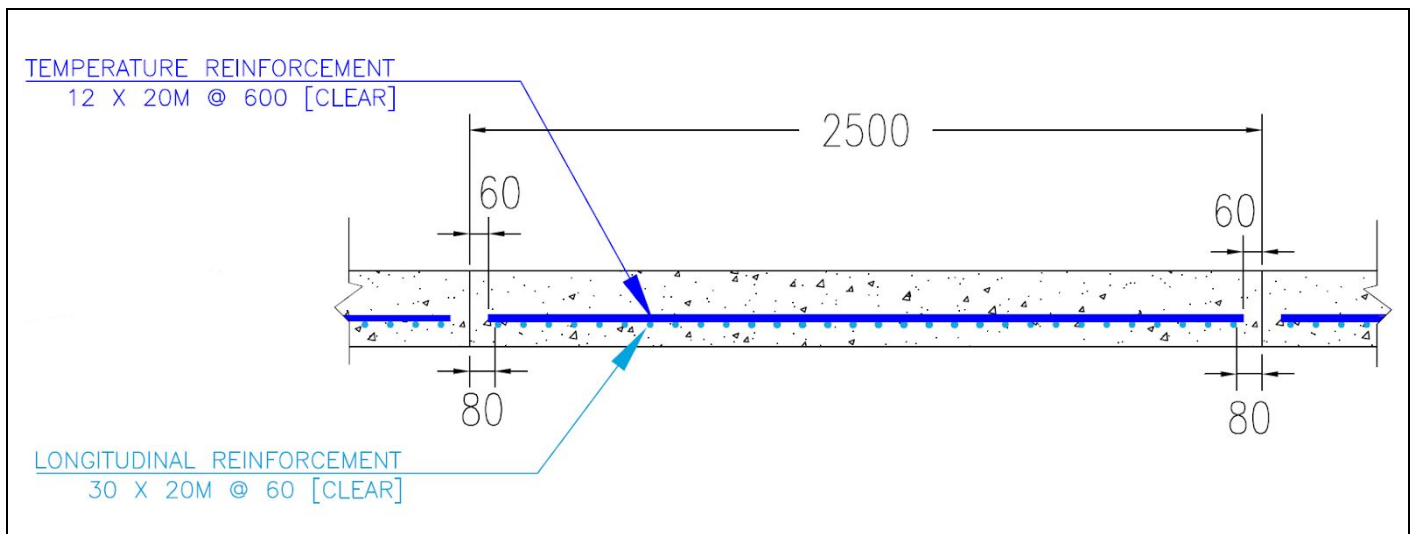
Underpass Detail - Floor Slab Cross-Section (East-West)
